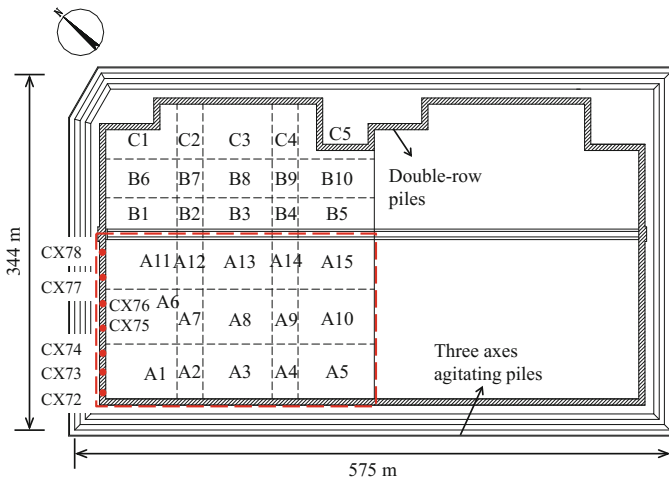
Foundation plan of the Bailonggang underground wastewater treatment
